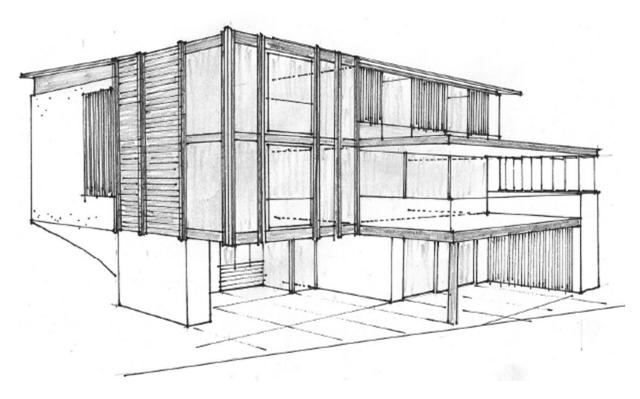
Sketch of the dwelling's western elevation (view from the swimming pool and surrounds)
